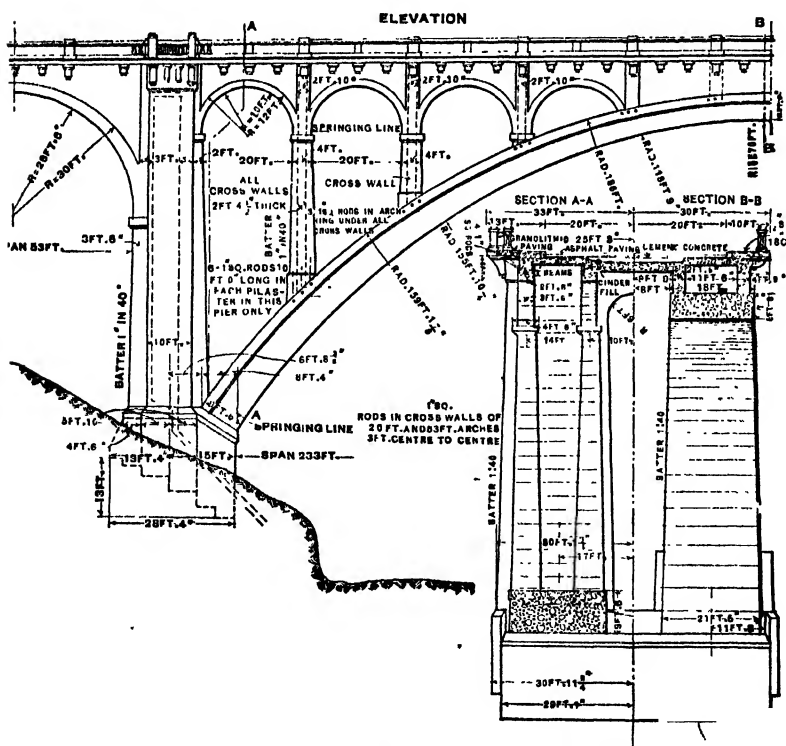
Walnut Lane Bridge, Philadelphia. (See p. 592.)
